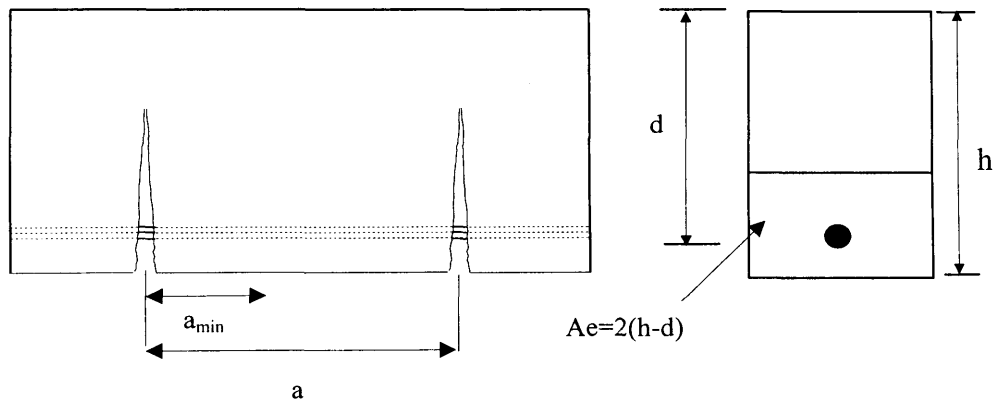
Cracking of a reinforced concrete member under flexure (After Park and Paulay 1975)
